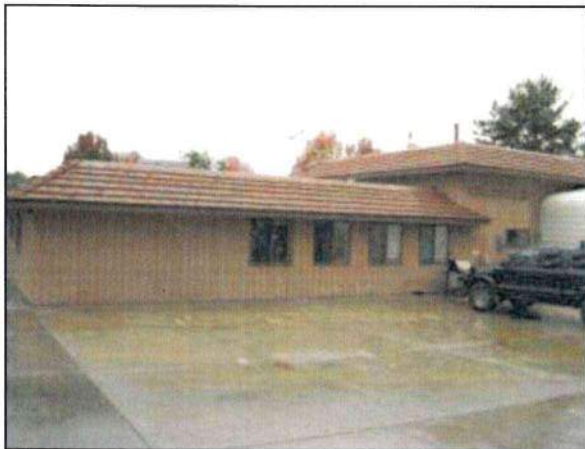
Fire Station #4 A general view of the rear of the fire station building.
